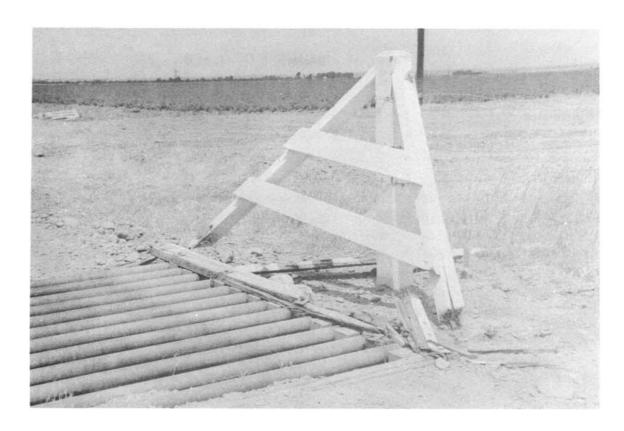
Damaged wing guard on standard cattle guard on Delta-Mendota Canal.
